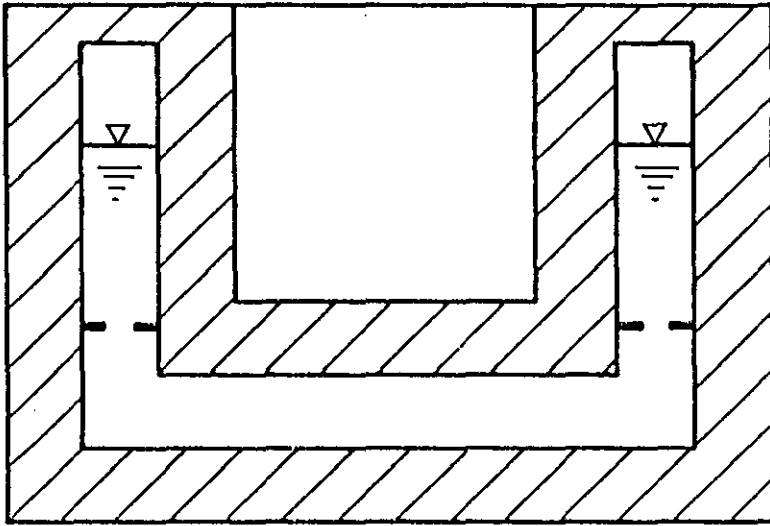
TUNED LIQUID COLUMN DAMPER SYSTEM
